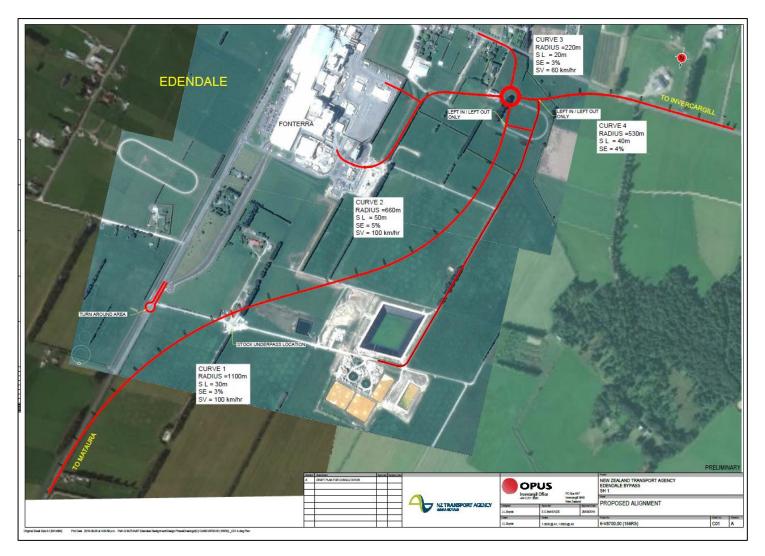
Plan showing the location of the proposed new road alignment and work footprint close to Edendale (Source: Client supplied drawing)
